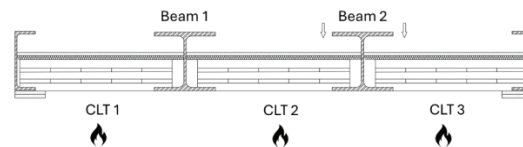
Schematic setup of a floor specimen with mechanical loading on beam 2
